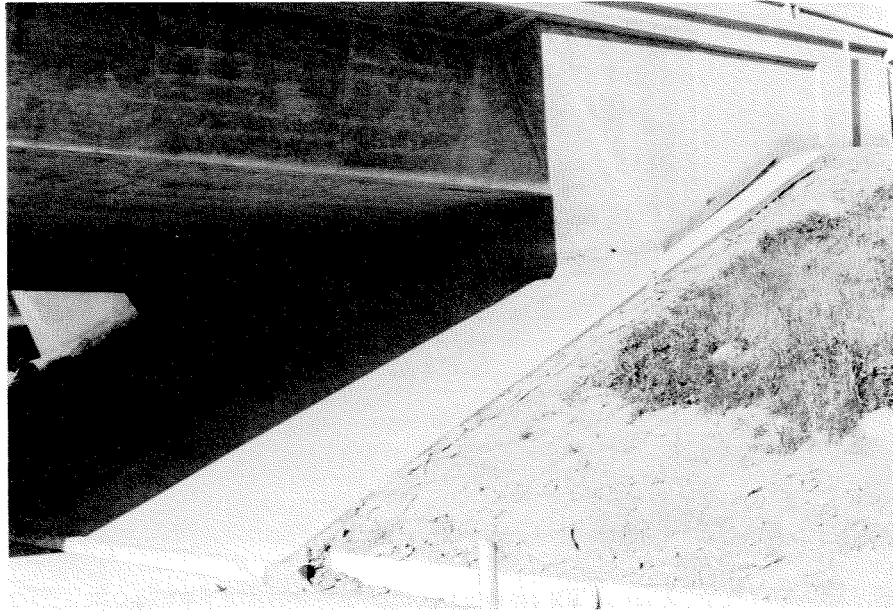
Northwestern abutment of the Maclay Street undercrossing, Foothill freeway. Note the movement of the concrete apron and the settlement of the embankment.
